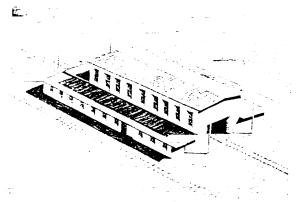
CONCEPT OF ROAD- AND RAIL-THROUGH
